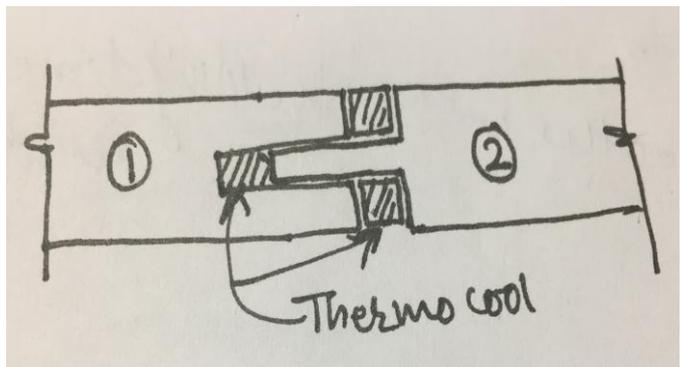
Joint of PRP wall blocks with thermo cool as a filler
